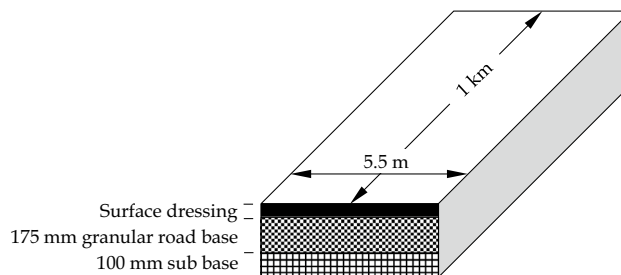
Sectional details of the granular road base type pavement for subgrade strength class S5 and traffic class T3 (not to scale)
